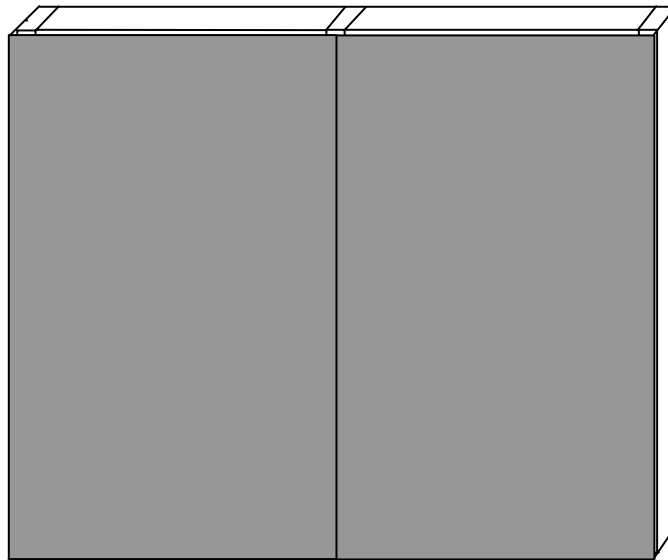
A simple shear wall with boards nailed to a wooden frame.
